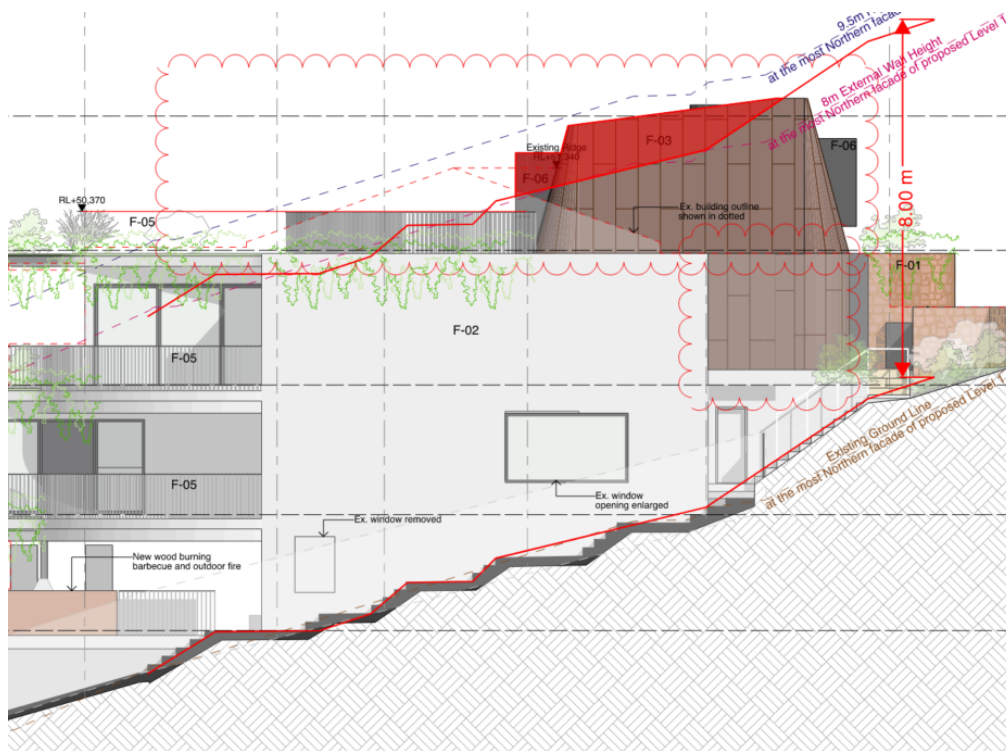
Extent of external wall height non-compliance – Northern Elevation
